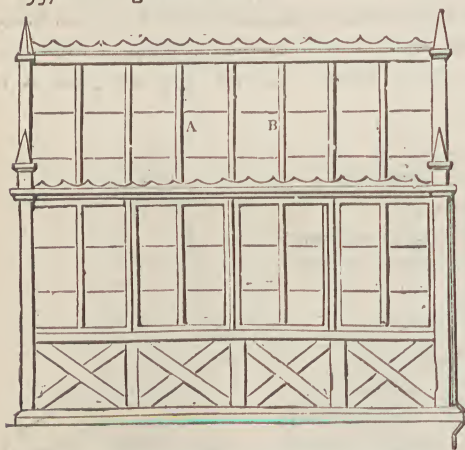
GREENHOUSE (FRONT ELEVATION).
